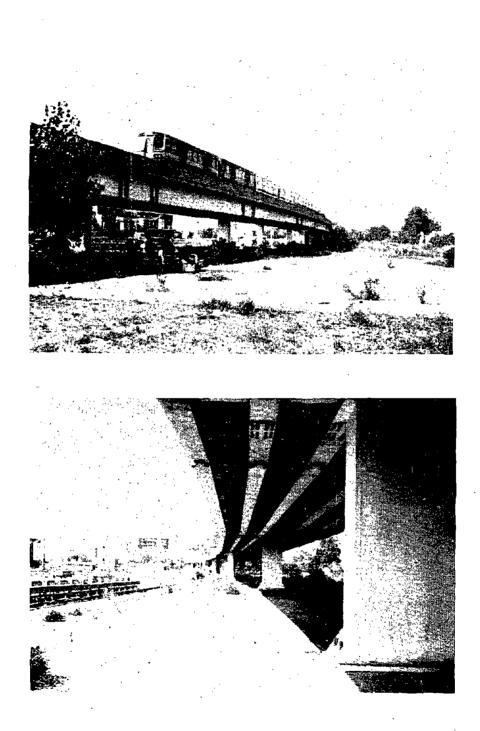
TYPICAL DETAILS OF THE CONCRETE DECK CTA ELEVATED STRUCTURE ON THE DAN RYAN SERVICE
